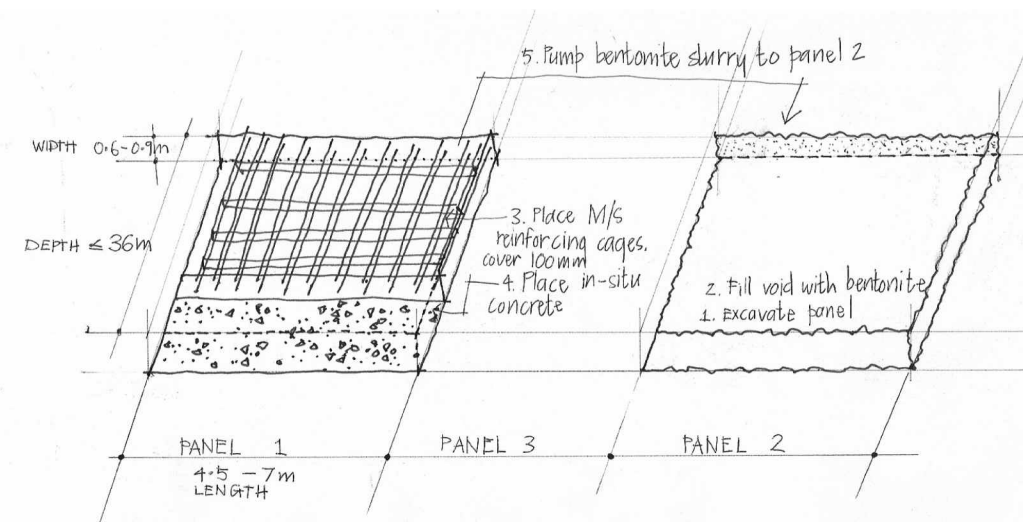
The Bentonite slurry method for the construction of deep trenches.
